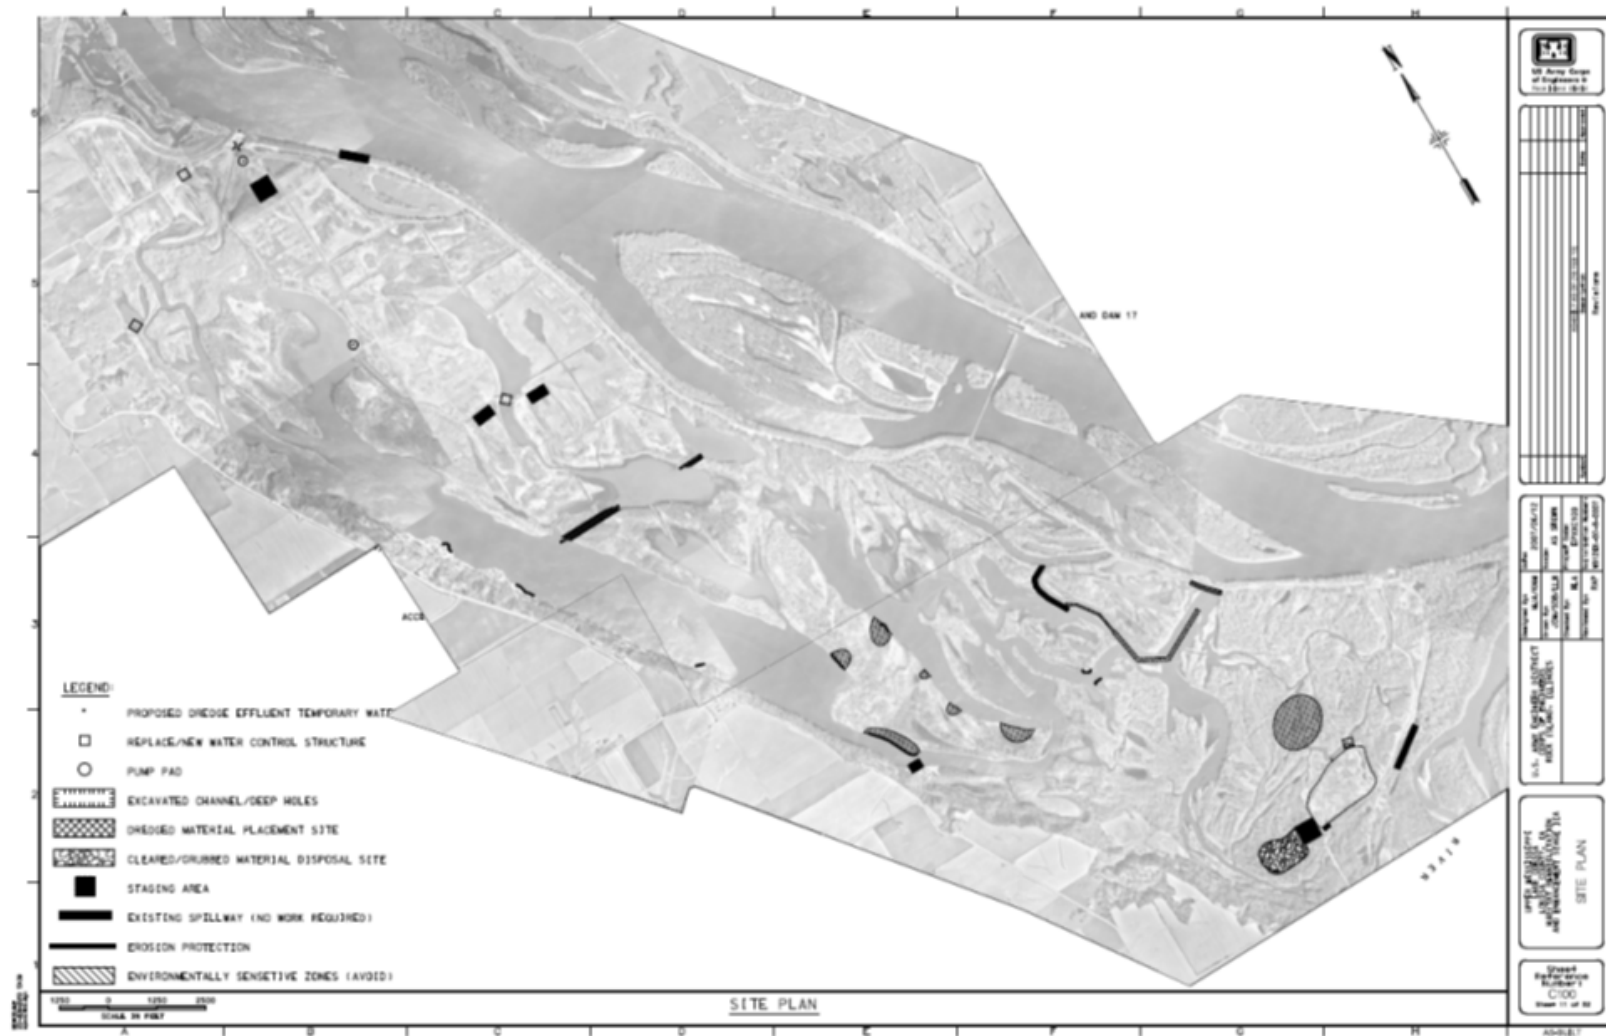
W912EK-07-C-0061 (Stage IIA) Site Plan
